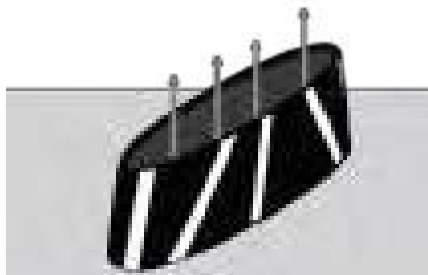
Install the anchors. To ensure that the threaded rod is correctly anchored, it should be rotated while being inserted into the hole (full of resin) so that it is covered completely with resin. Once the resin is dry, tighten the nuts with the socket wrench.
